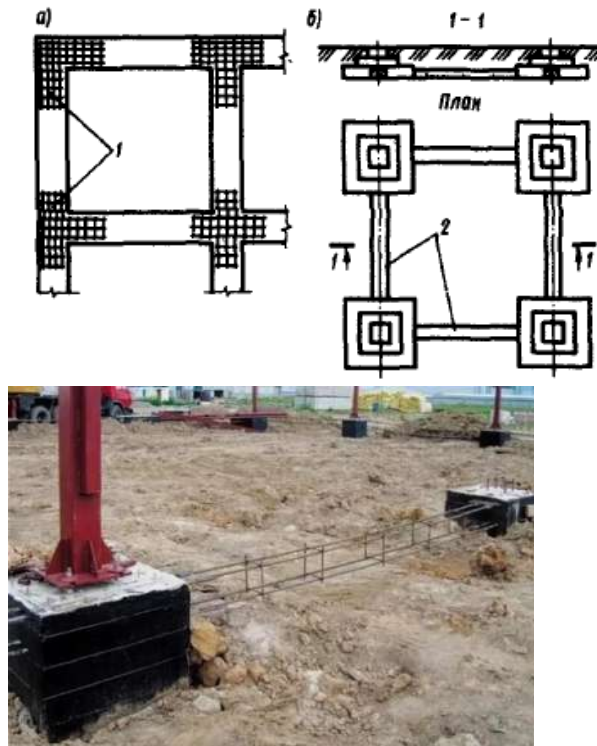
Examples of existing structures of seismic resistant foundations: a – strip foundation, б – foundation piers; 1 – reinforcement fabric, 2 – grade beams.
